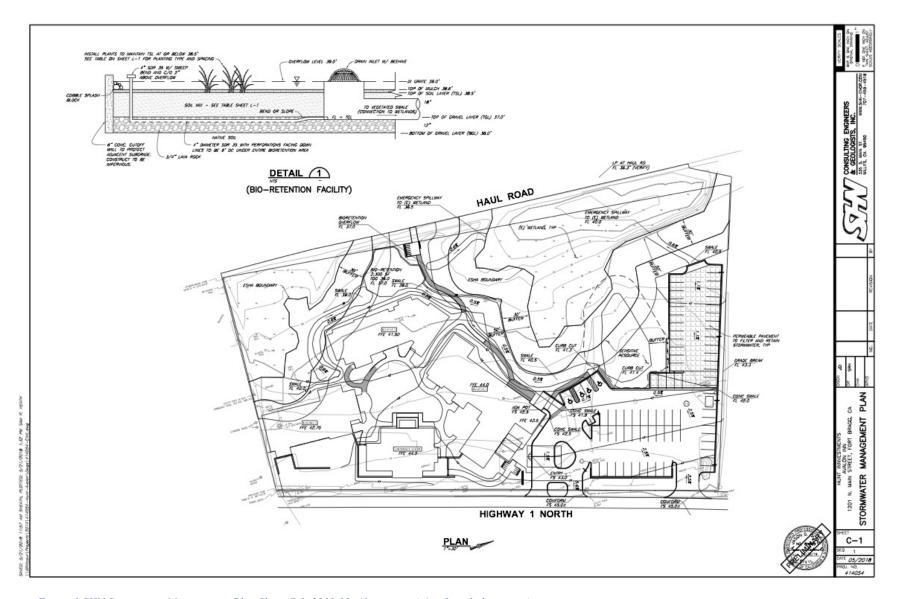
SHN Stormwater Management Plan Sheet C-1, 2018.08, Alternative A (preferred alternative).
